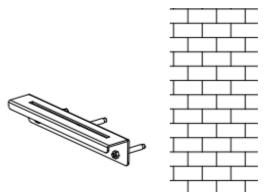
The installation of the hanging boardStep 3: Lock the expansion bolt until the expansion bolt is attached to the wall.Put on photovoltaic inverter.
